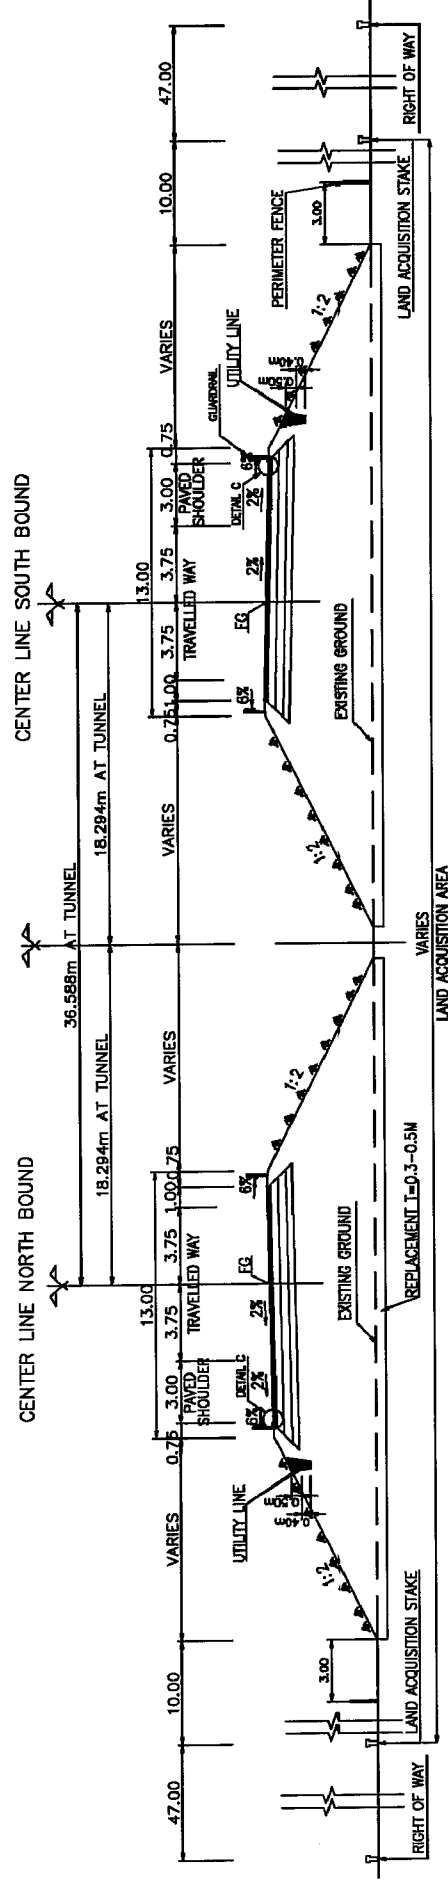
Typical Cross Section of Expressway at Separated Alignment for Tunnel Approach
